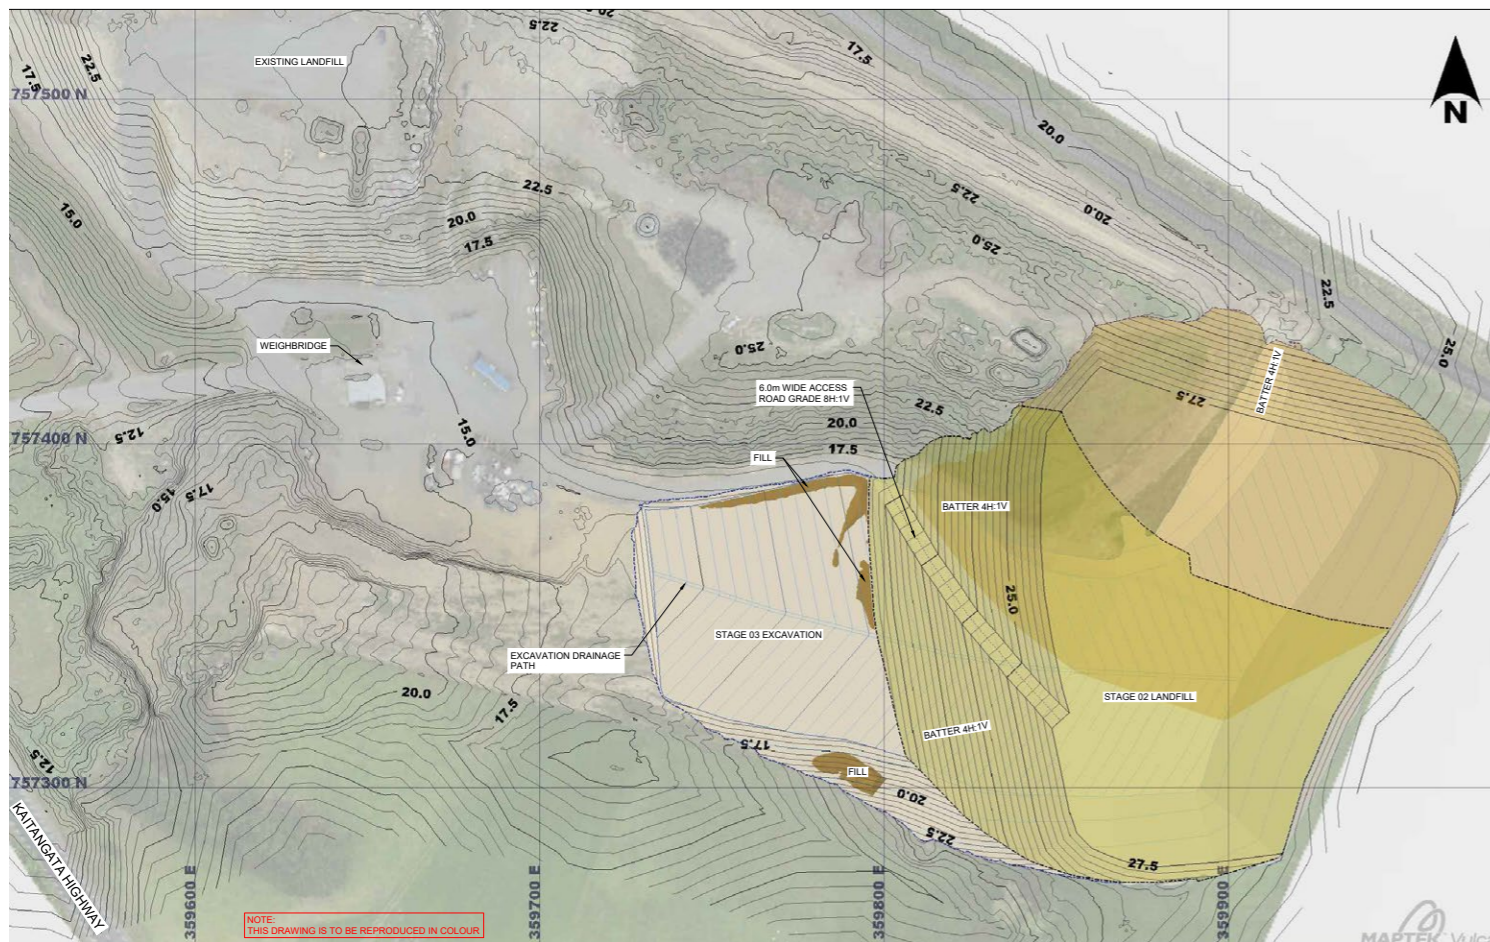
Proposed Expansion Plan – Mt Cooee Landfill
